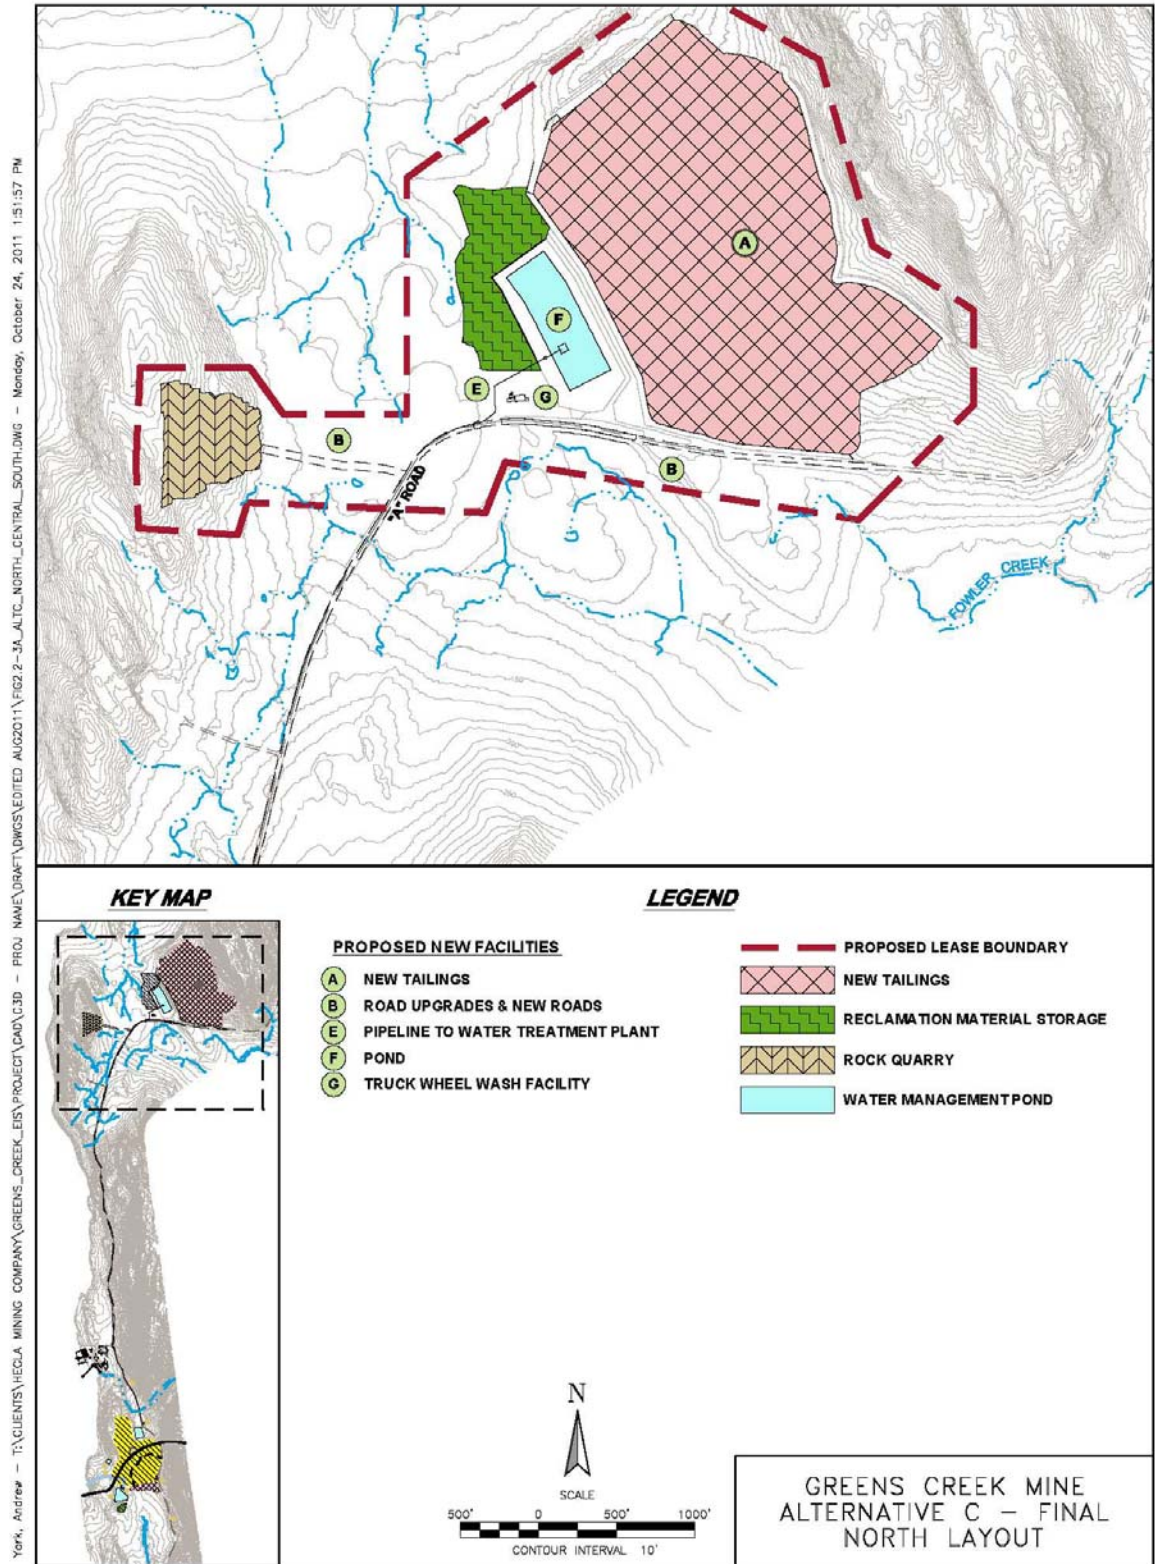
Greens Creek Mine Alternative C – Final North Layout.
